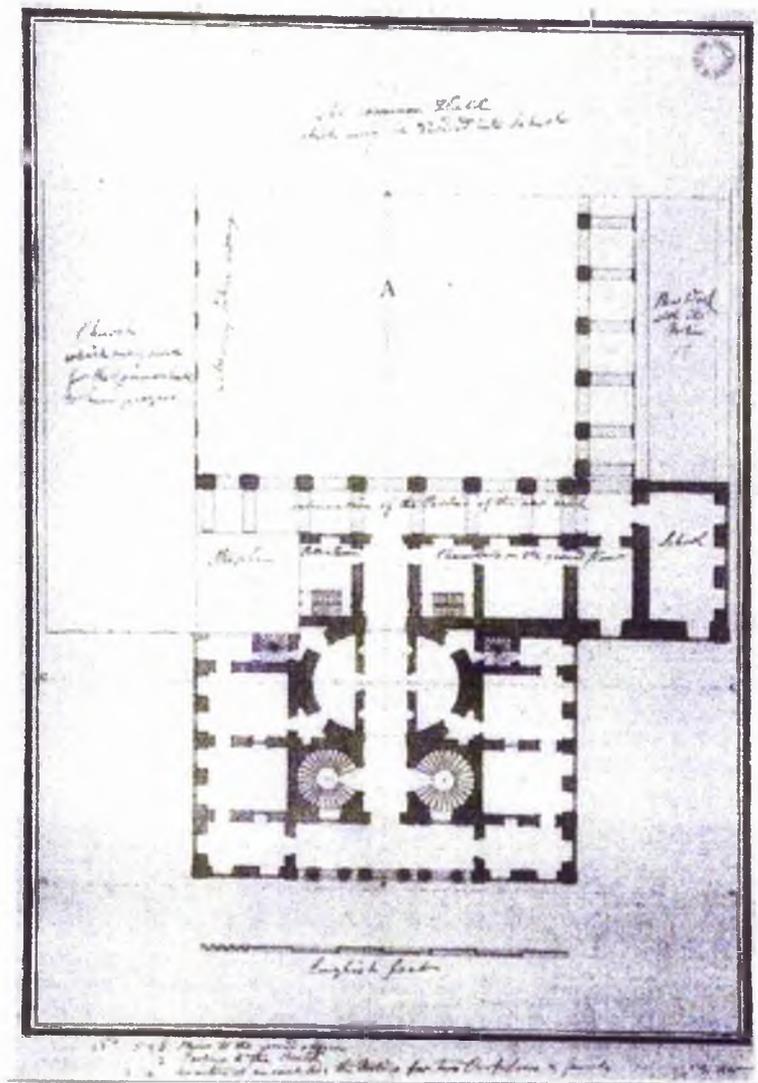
King's College. Proposed plan of new building. J. Byres, 1785.
